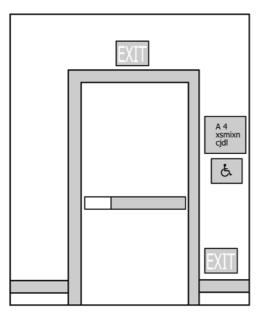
Floor Proximity Exit Sign Mounted Adjacent to Fire Rated Exit Door
